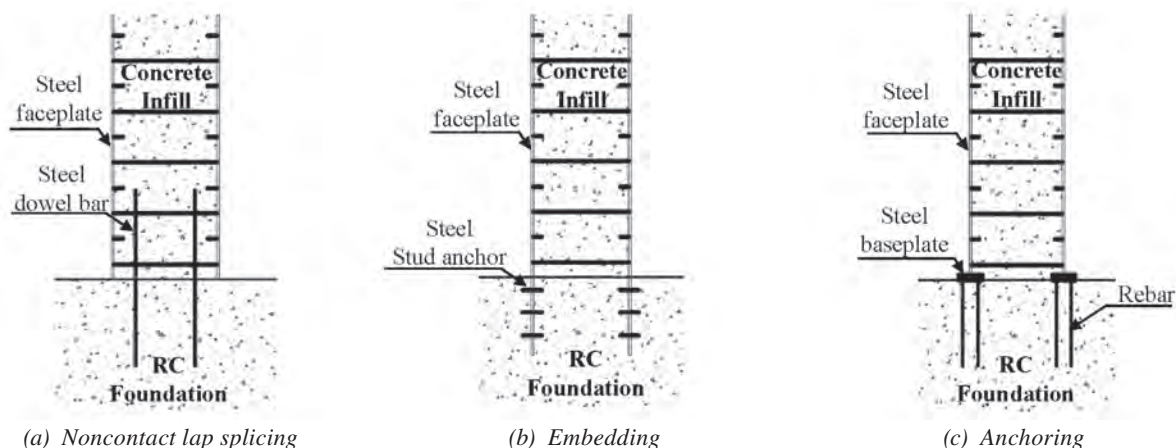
Connection techniques for SC wall-to-RC foundation (Seo and Varma, 2017a).
